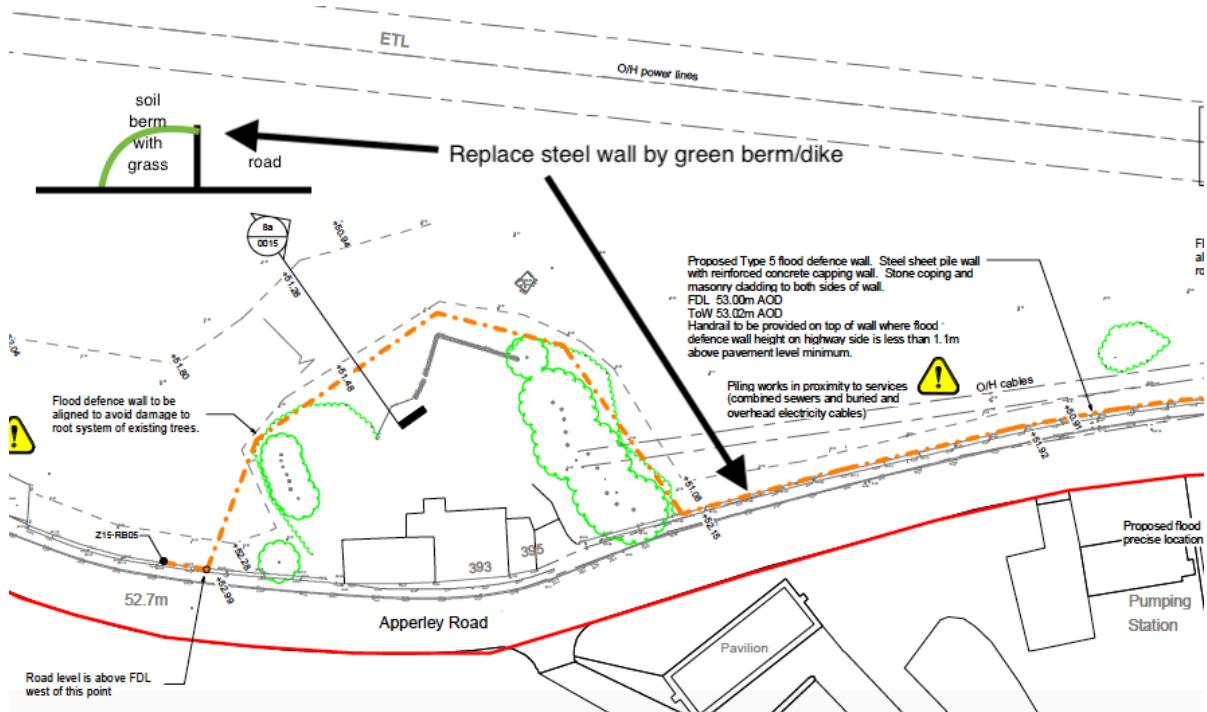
Graph relating to point a) above. Natural green berm/dike instead of industrial steel-sheet pile wall. Subsection of drawing in [1] along Apperley Road. Black arrows, larger text and cross-section of new berm against existing wall (upper-left) added by OB.
